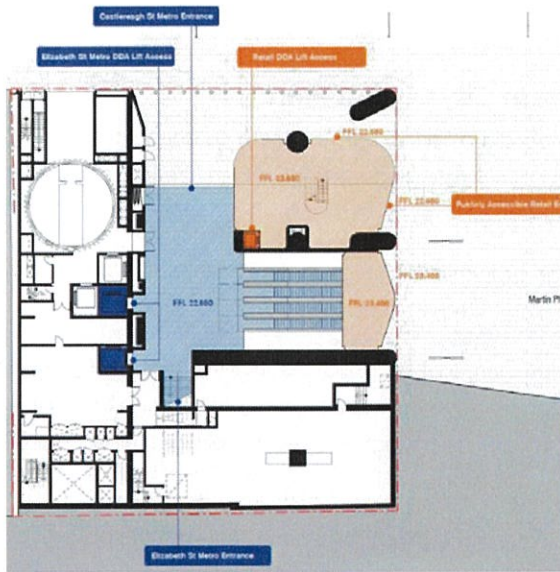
| Lower Ground Floor Plan (Castlereagh St) showing proposed OSD entry, station entry and retail areas (Source: Applicant's RtS)
